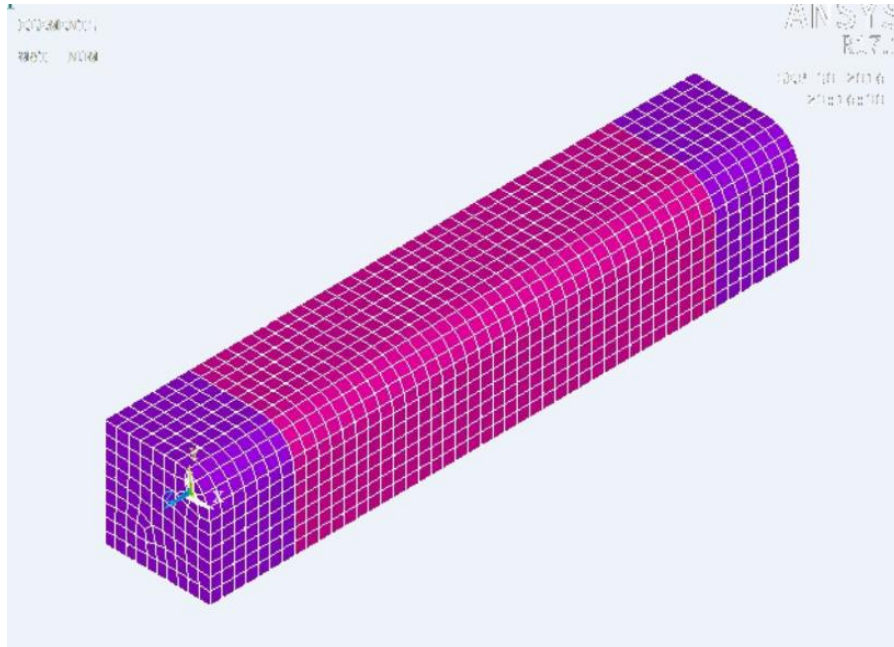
Mesh of the Concrete and Steel Plates – column Model
